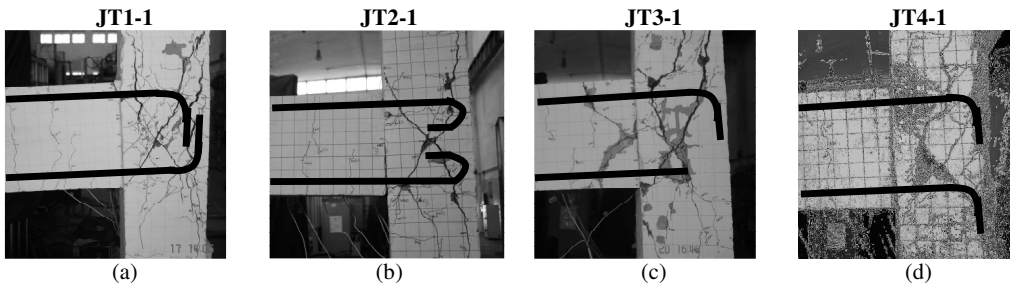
Influence of anchorage of beam bars in the core on the cracking pattern: a) bars bent into the joint; b) plain round bars with 180°-hooks; c) top bars bent in and bottom bars with straight anchorage; d) top bars bent in and bottom bars bent away from the joint
